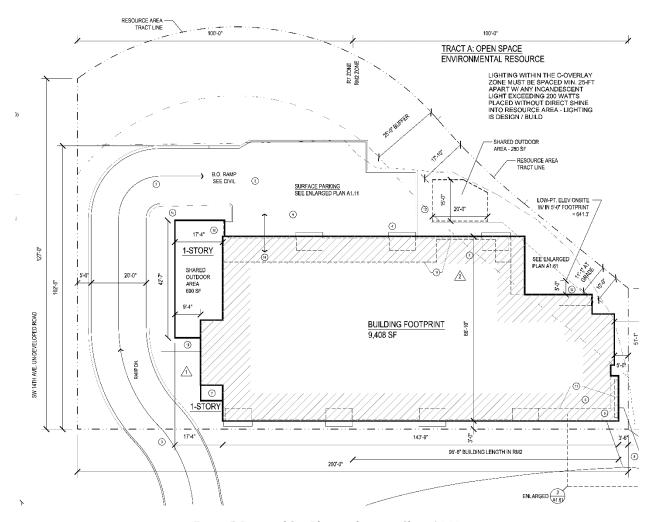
Proposed Site Plan, as shown on Sheet A1.00.
